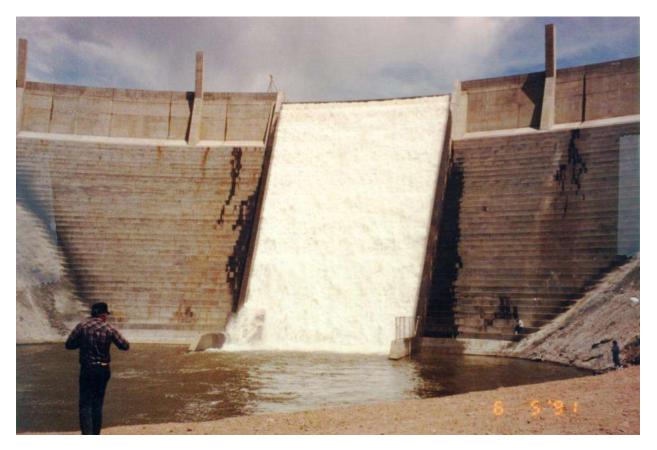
Service spillway flows confined by training walls on stepped downstream face of Santa Cruz Dam (Reclamation).
